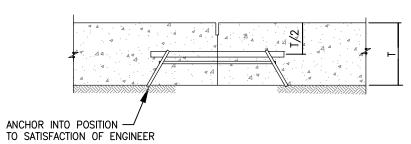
CONSTRUCTION JOINTN.T.S.
